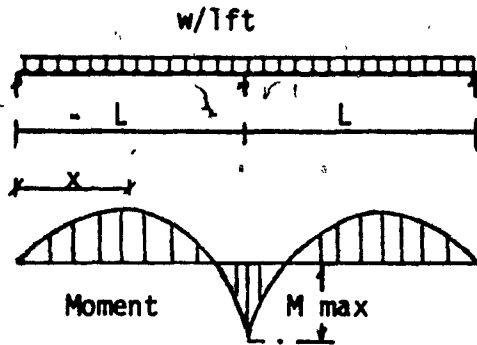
SCHEMATIC OF ROOF SYSTEM
